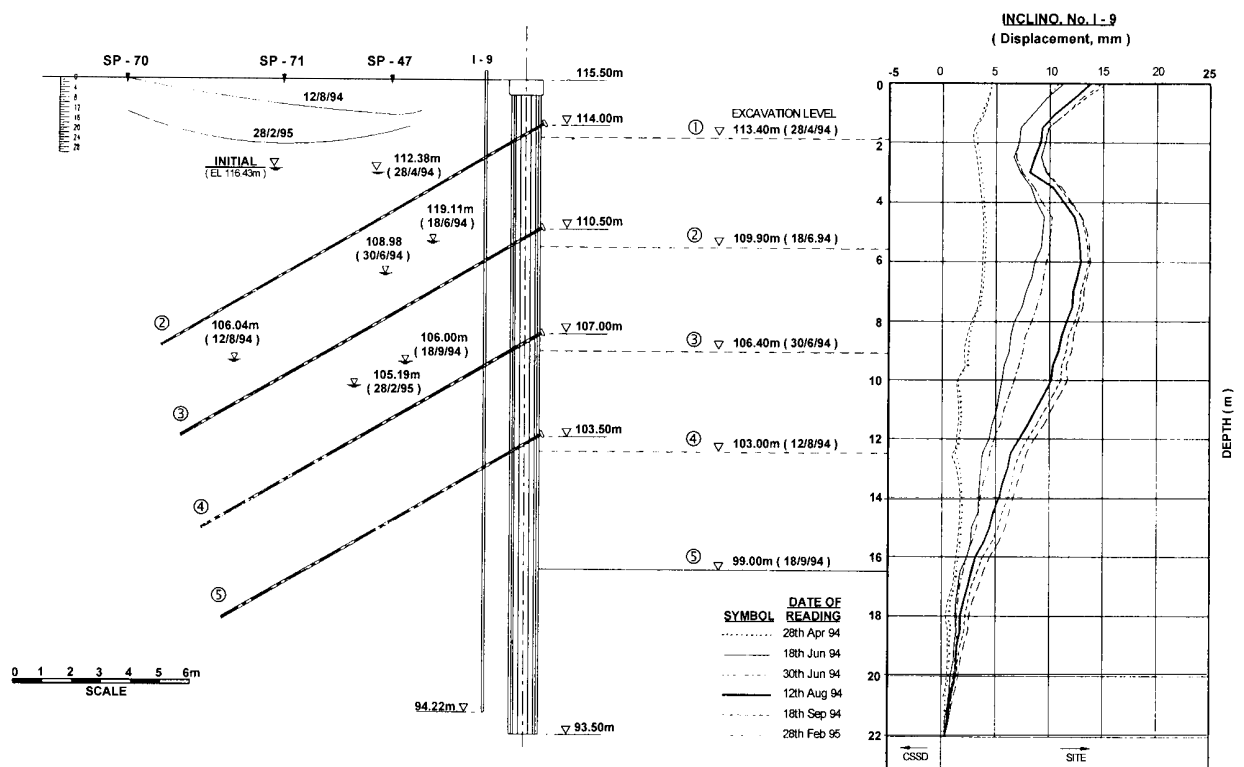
Typical Excavation Profile at GRW 2 (I-9)
